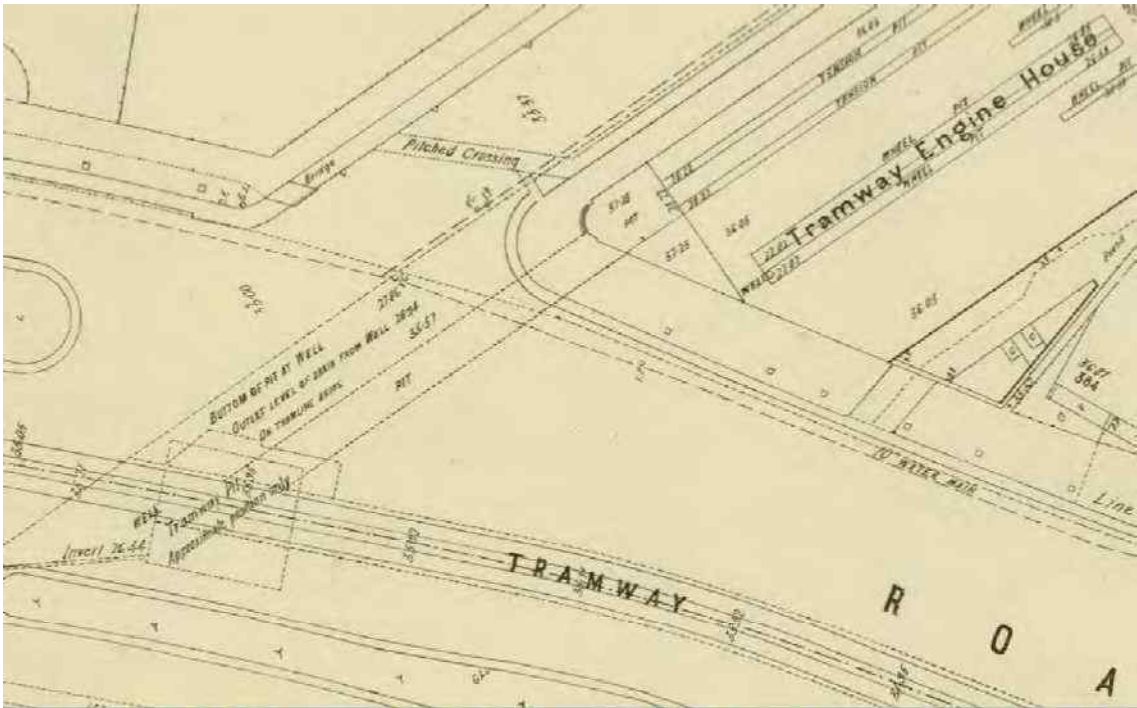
Melbourne Metropolitan Board of Works (MMBW) detail plans 896 and 897 of St Kilda Road Cable Tram infrastructure, 1896
